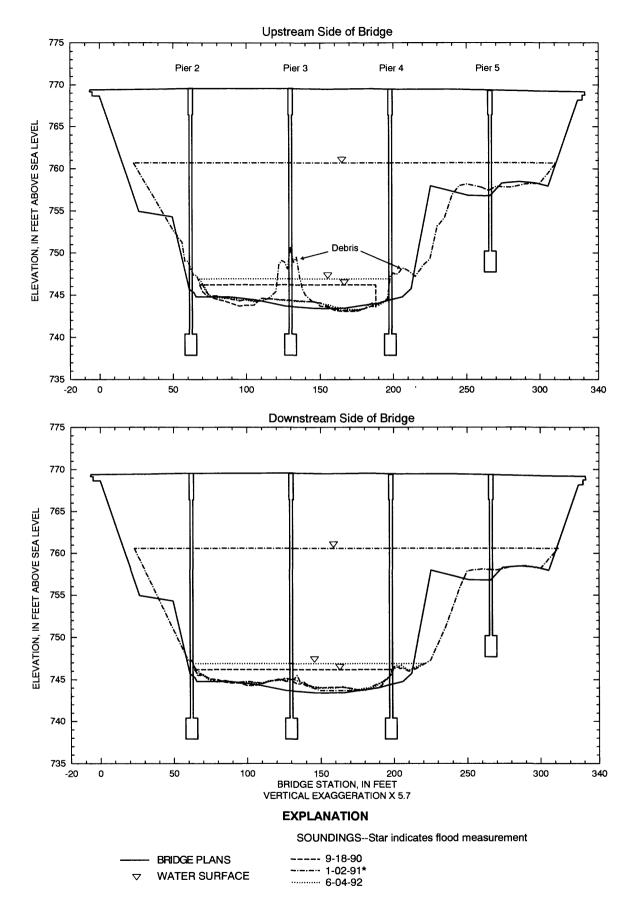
Cross sections showing bed elevations from bridge plans and soundings, State Road 1 over St. Marys River at Fort Wayne, Indiana.
